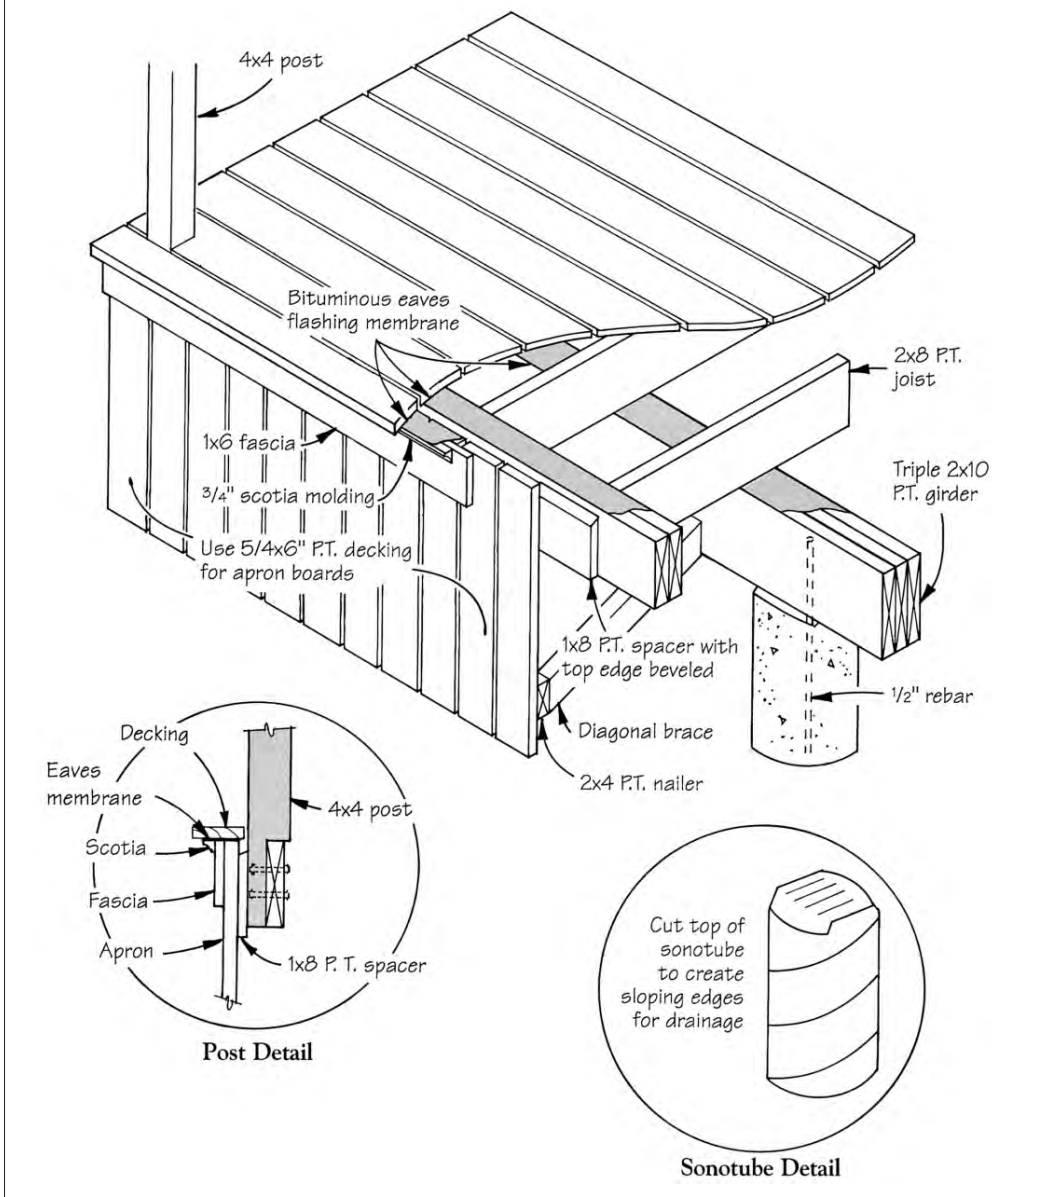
To provide protection against decay, the author covers all sandwich constructions, like the triple 2x girder, with eaves flashing membrane. A beveled 1x spacer directs water through the spaces between the vertical apron boards. Even the sonotube is fashioned to create a watershedding surface at the top.
